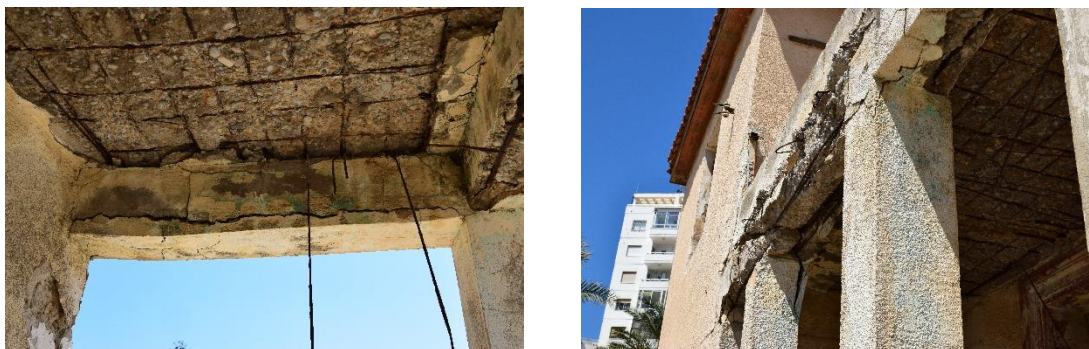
Corrosion-Induced Spalling and Cracking Due to Cast-in Chlorides in an Abundant Old Building. Palm Beach Area, Mağusa, North Cyprus. (Case Study #23 (Page 115)).
